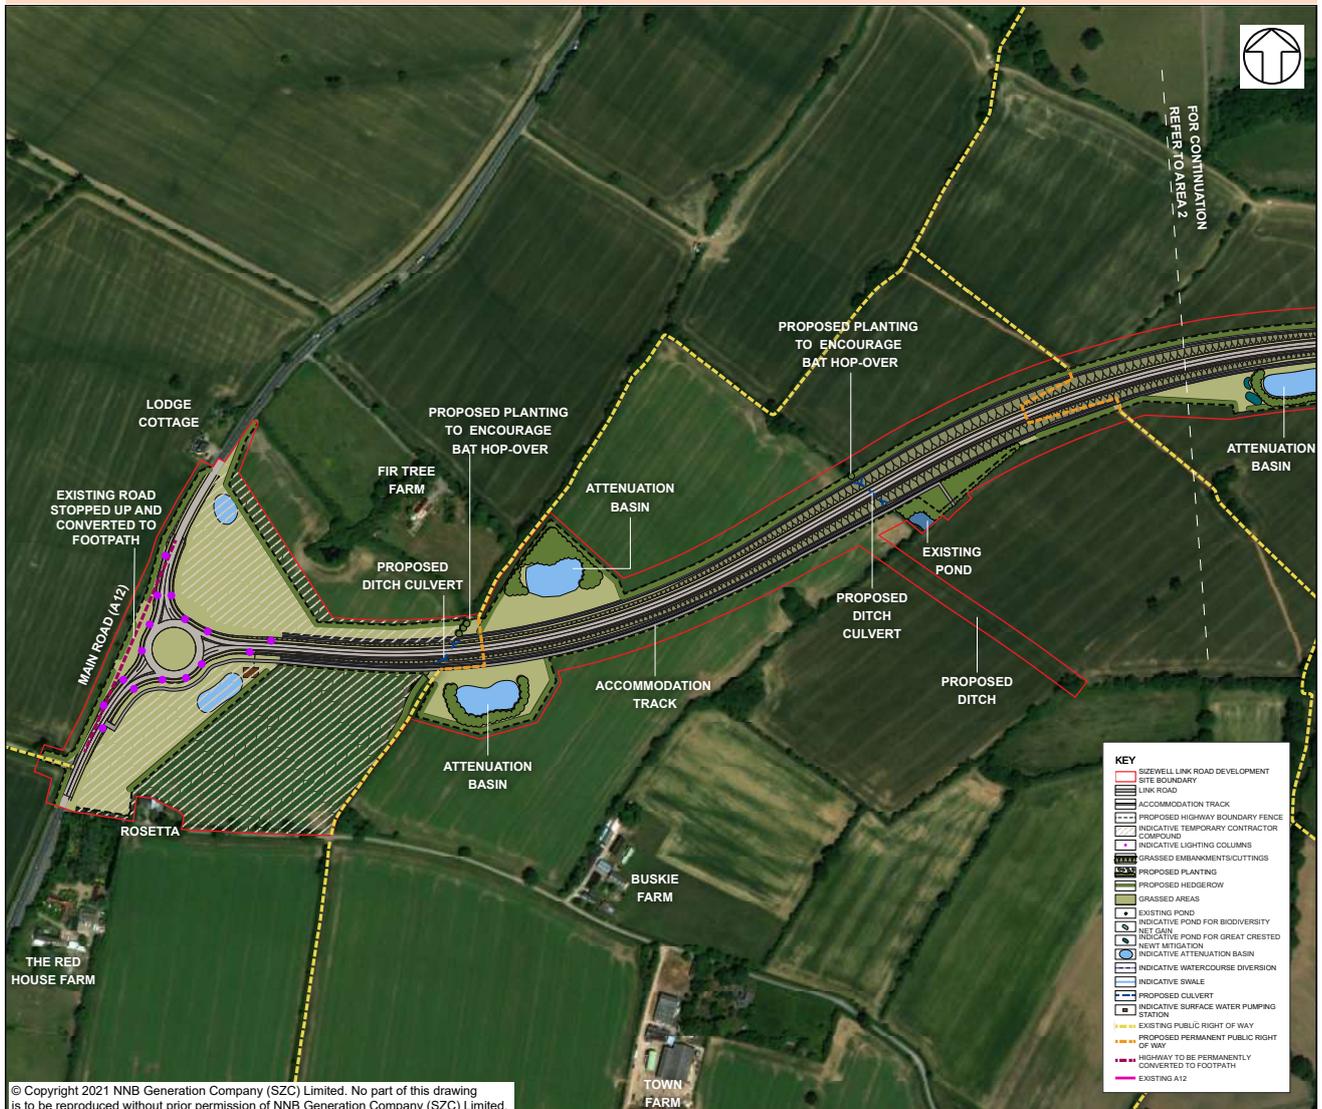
B: Illustrative masterplan of the Sizewell link road – Inset 2
